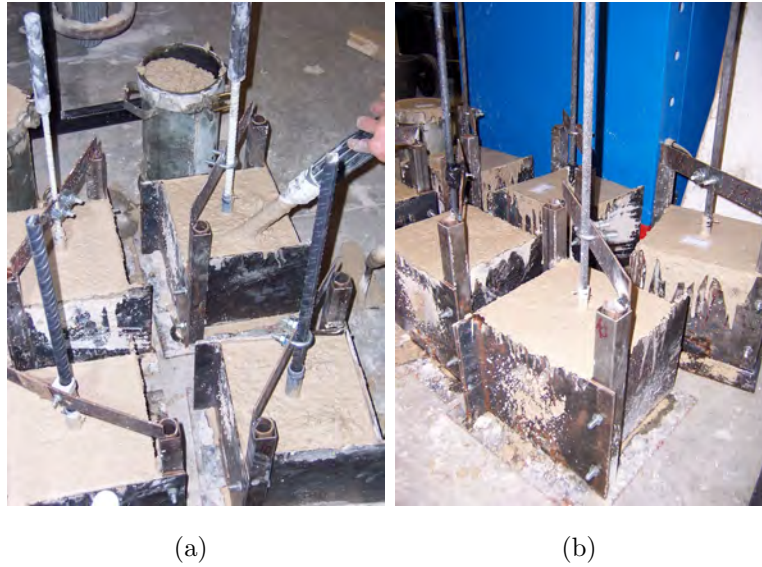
(a) Vibration of concrete with hammer vibrators and (b) final specimen.
